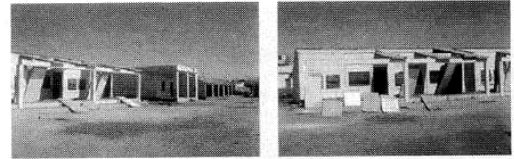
A school in Gandhidham had both traditional construction as well as RC precast buildings. In the precast building, the roof panels were dislodged atop the precast frame/wall system due to inadequate connections. In contrast, the traditional constructions alongside did better.
